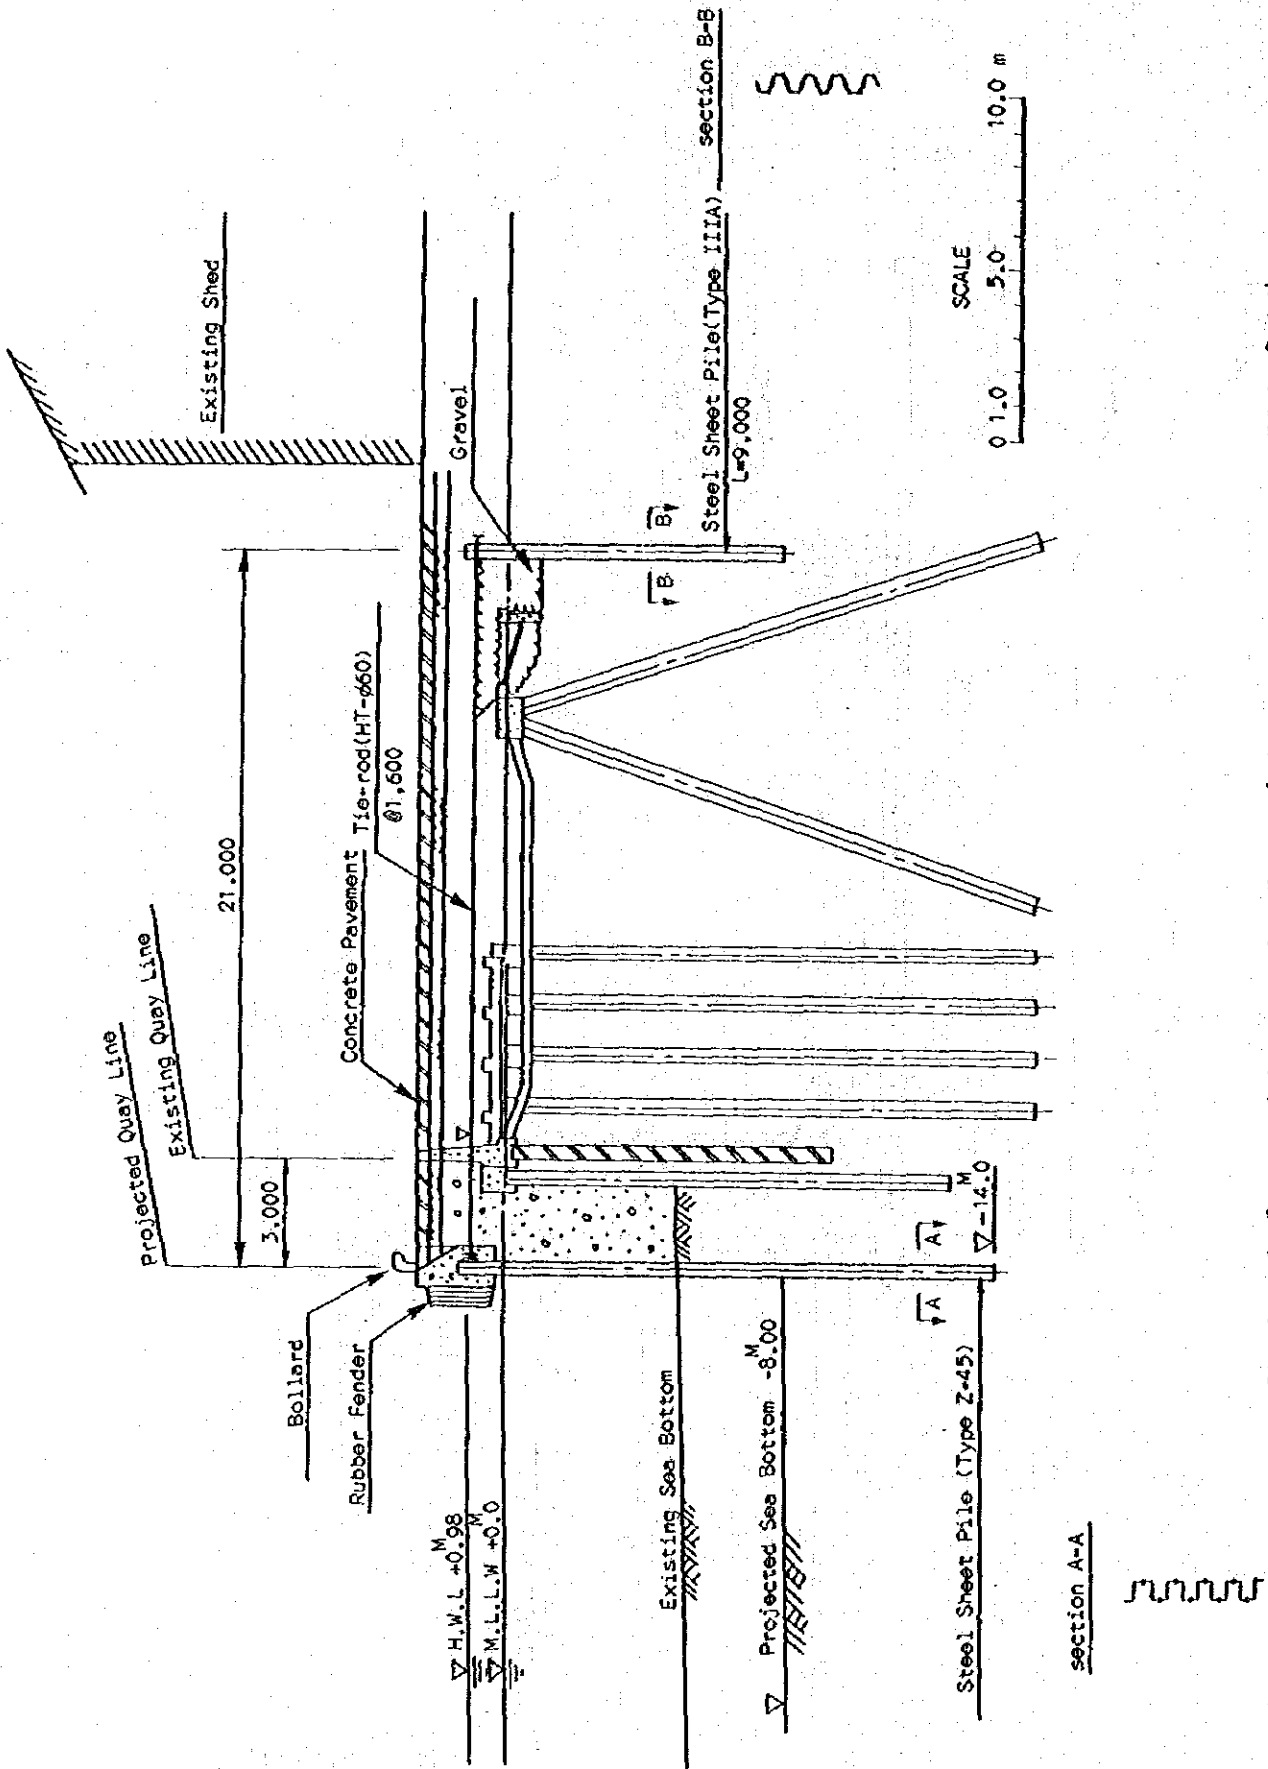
Proposed Section for Pier 16 (Projected Depth is MLLW -8.0M)
